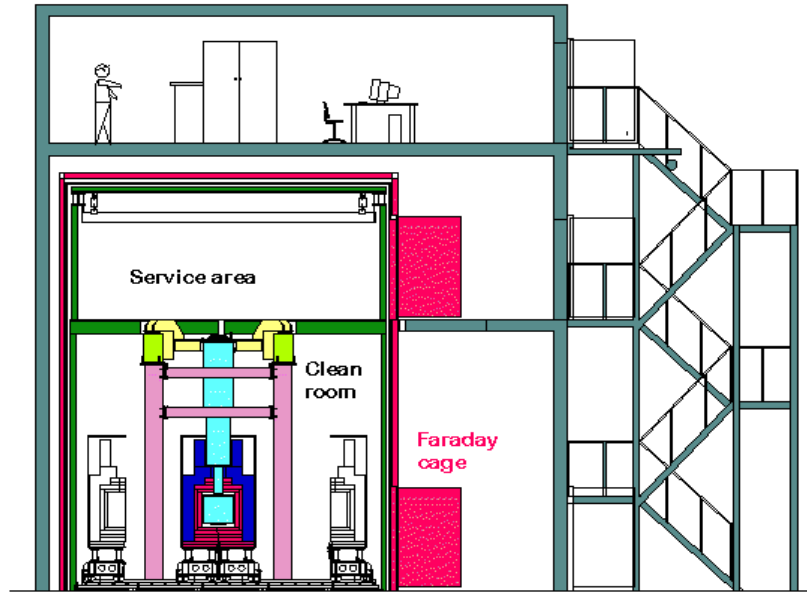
Schematic drawing of the three level CRESST building in hall B of the Gran Sasso Underground Laboratory.
